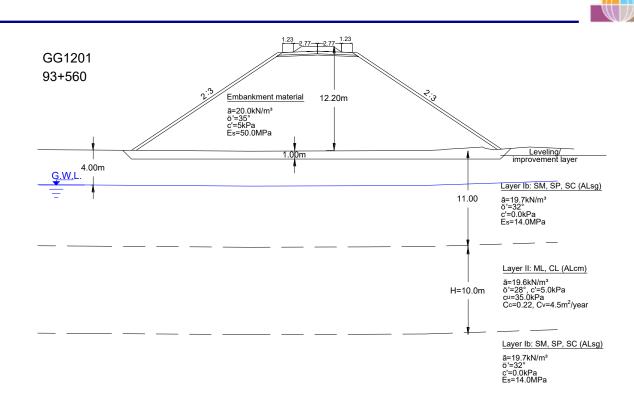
Critical cross-section used in the geotechnical calculations of the embankment.
